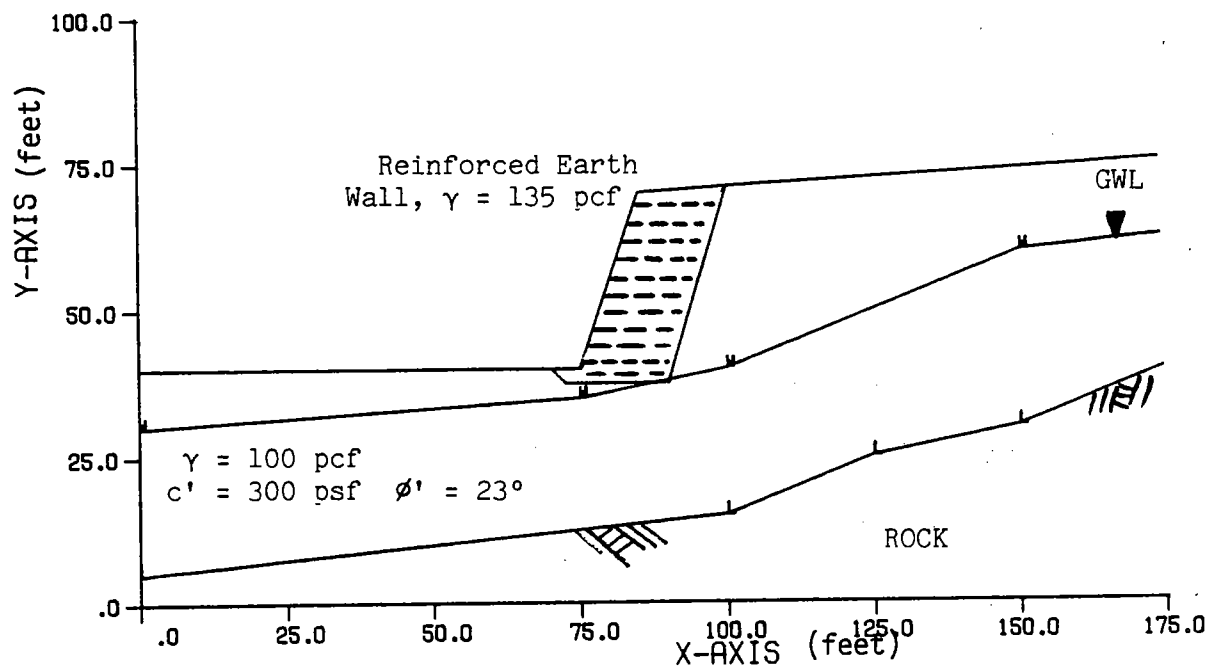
, Subsurface Profile, Reinforced-Earth Wall
